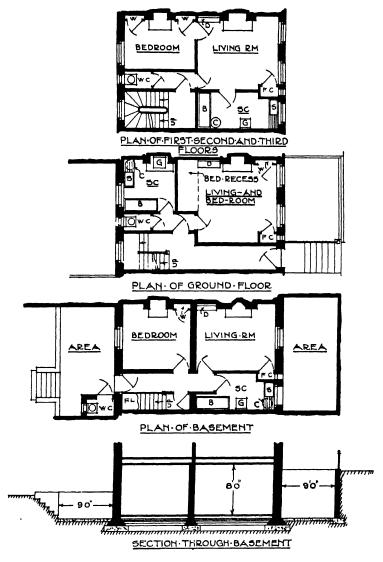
Conversion of terrace house (Fig. 72). Ground floor into one-room;
